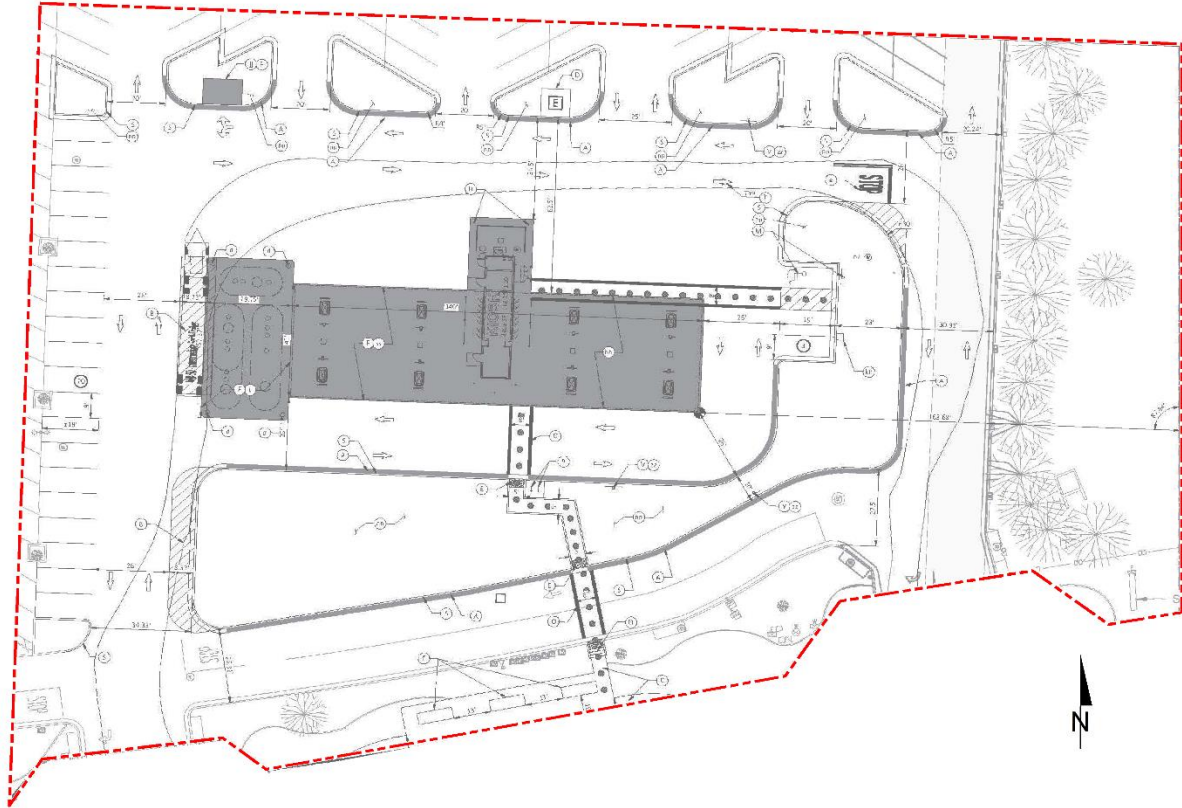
B: PRELIMINARY SITE PLAN
